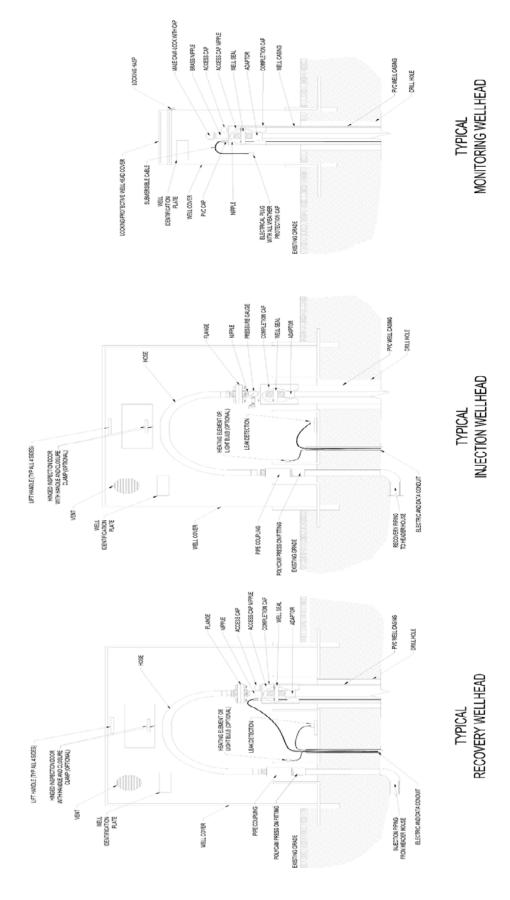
Schematic of Typical Production, Injection, and Monitoring Wellhead Construction (AUC, 2015)
